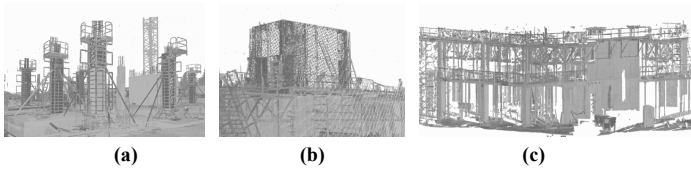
Temporary and Secondary objects at E5 Building site: (a) column formworks – July 25, 2008; (b) Rebar – September 19, 2008; (c) Slab formworks and shoring – October 9, 2008.
